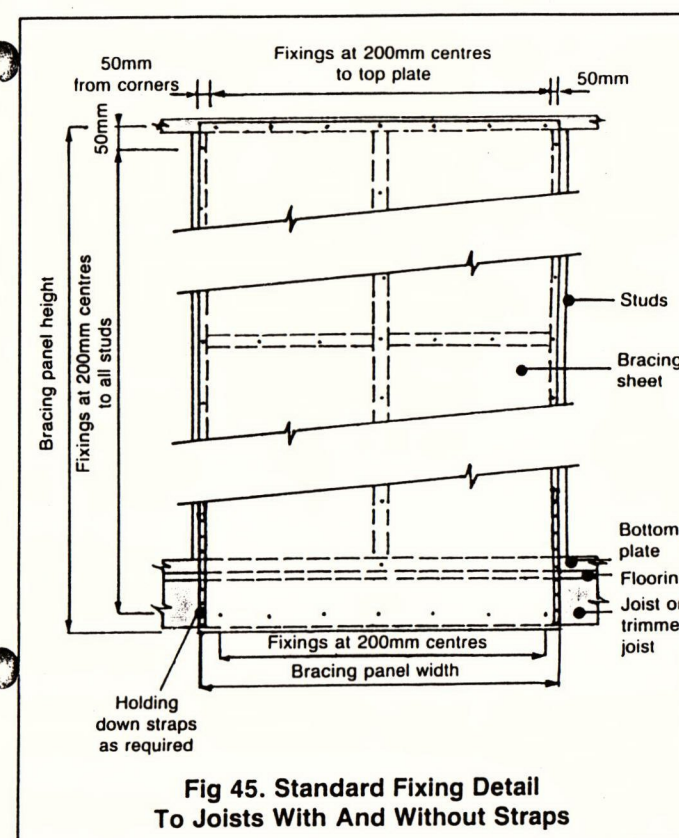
Standard Fixing Detail To Joists With And Without Straps
